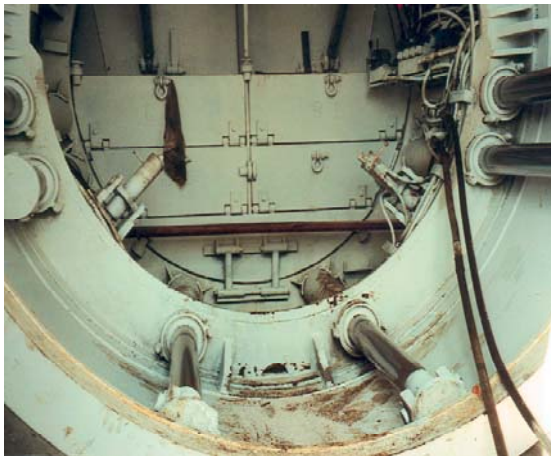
Photo showing tunnel boring machine equipped with jacking ring to uniformly transfer jacking loading into the tunnel liner.
